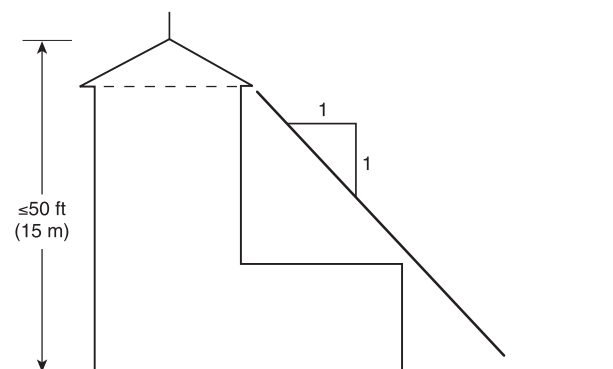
(b) Lower Roof Protection Provided by Pitched-Roof Buildings 50 ft (15 m) or Less in Height.
